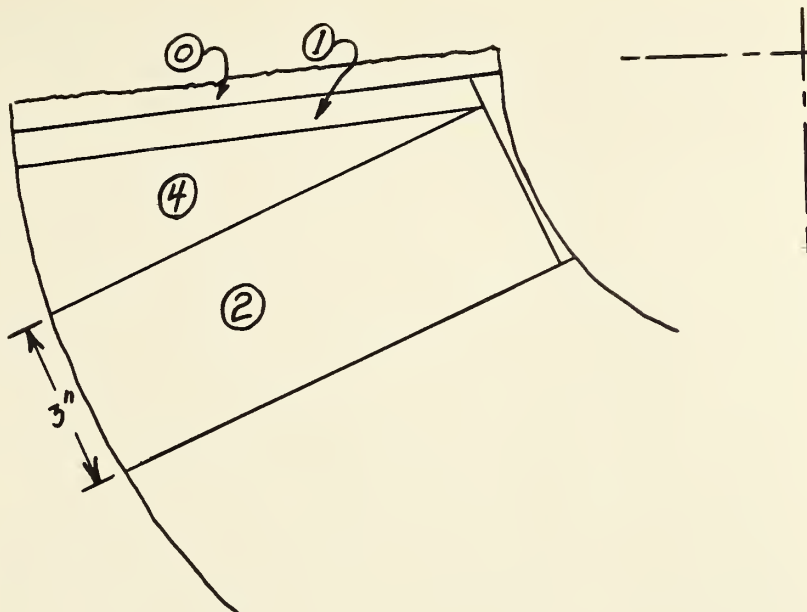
Modified plan for cutting specimen blanks from eye C3.
